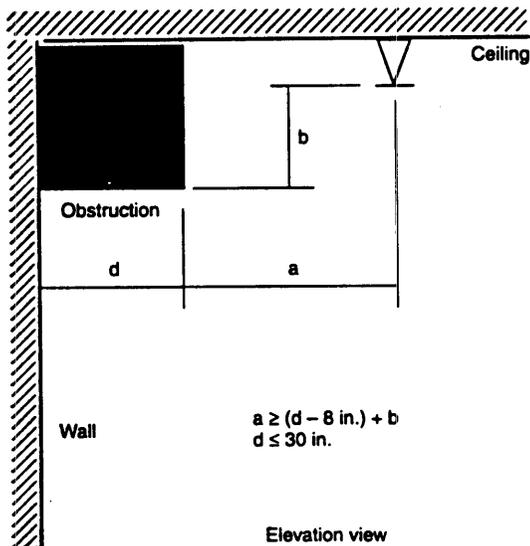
(b) Obstructions against walls (SSU/SSP).
